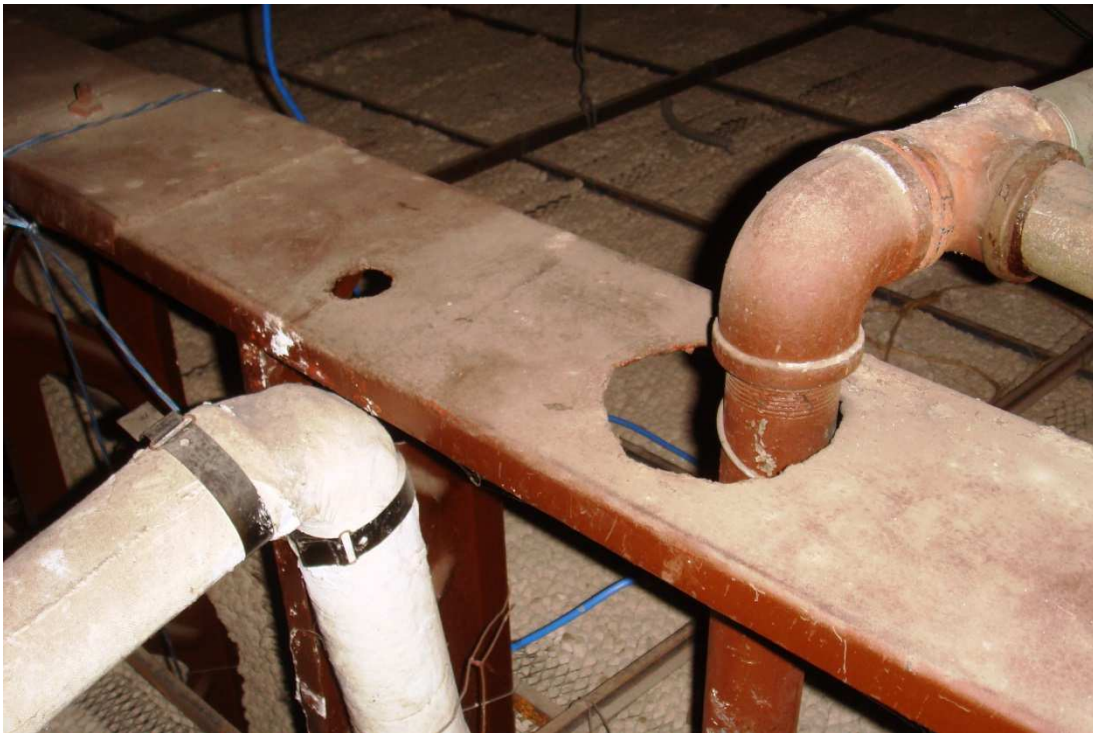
Interior Braced Wall Panel above Ceiling (note large pipe penetrations and minimal track splice at left)
